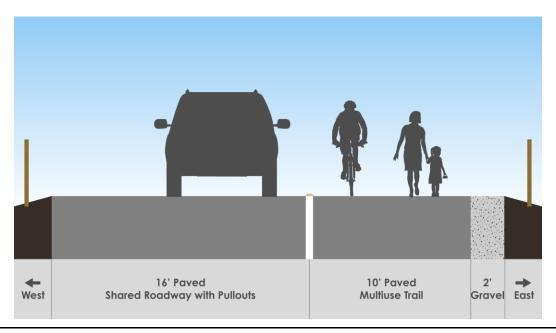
Segment 1 Paved Multiuse Trail Alternative
